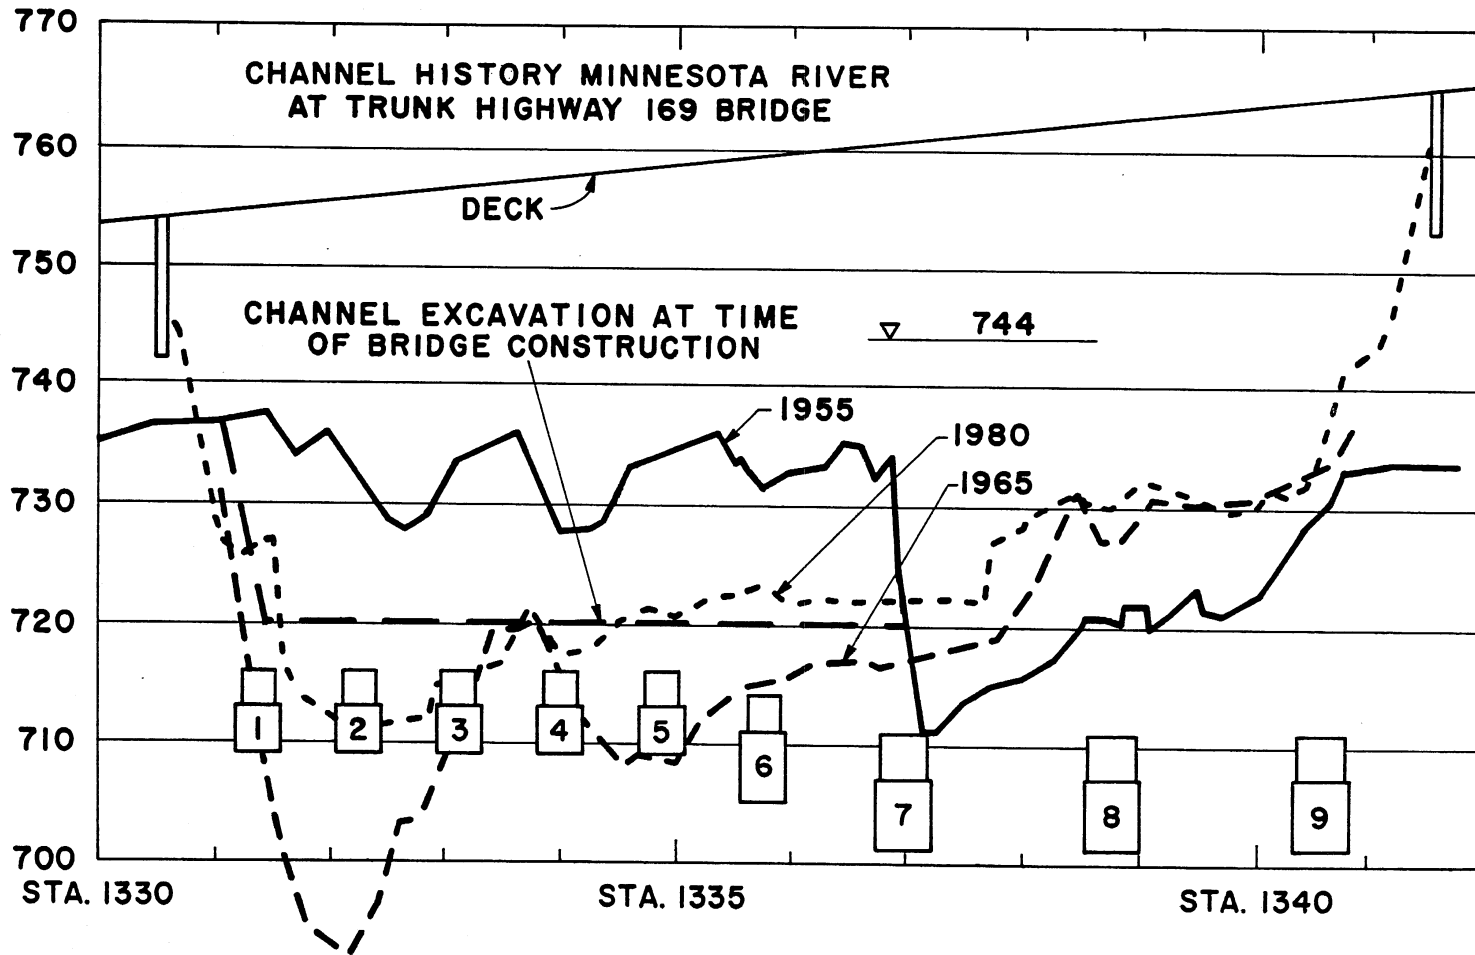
Sketch of the bridge footings and seals, and several cross sections at the bridge. Elevation is in feet above sea level. The water surface elevation of the peak of the 1965 flood at the bridge was 744 ft above sea level.
